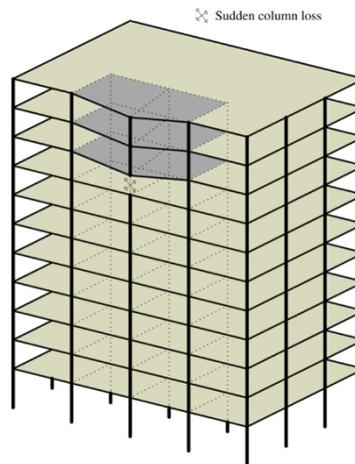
Multi-storey framed structure under sudden column loss scenario (Izzuddin et al., 2008)
